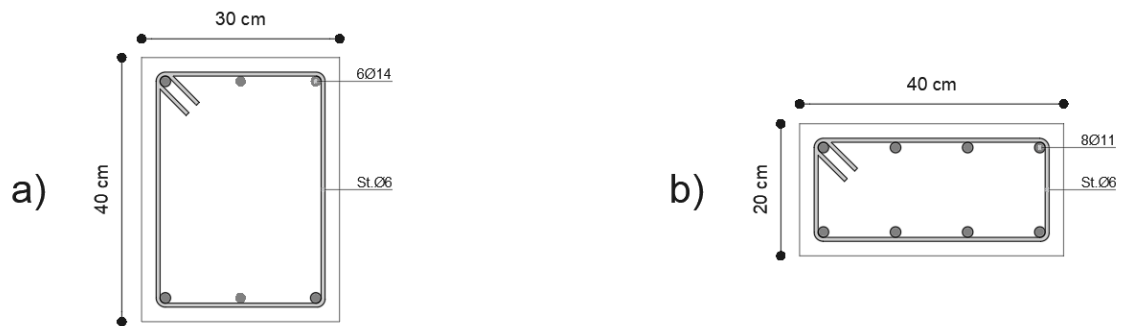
Typical column (left) and beam (right) reinforcement details for D Template (82/3) building
